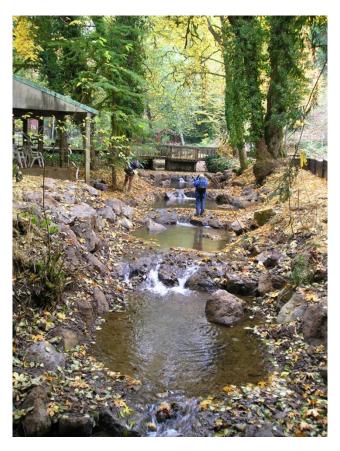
Example of boulder weirs used to raise a channel profile to support an existing bridge (Murtaugh Creek, OR)
